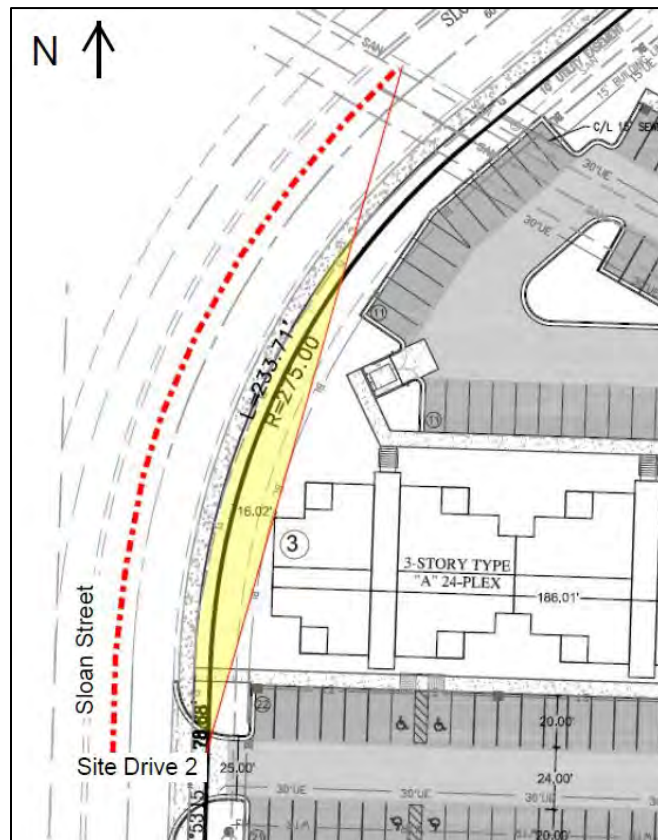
Driver's Line of Sight Looking North from Site Drive 2
